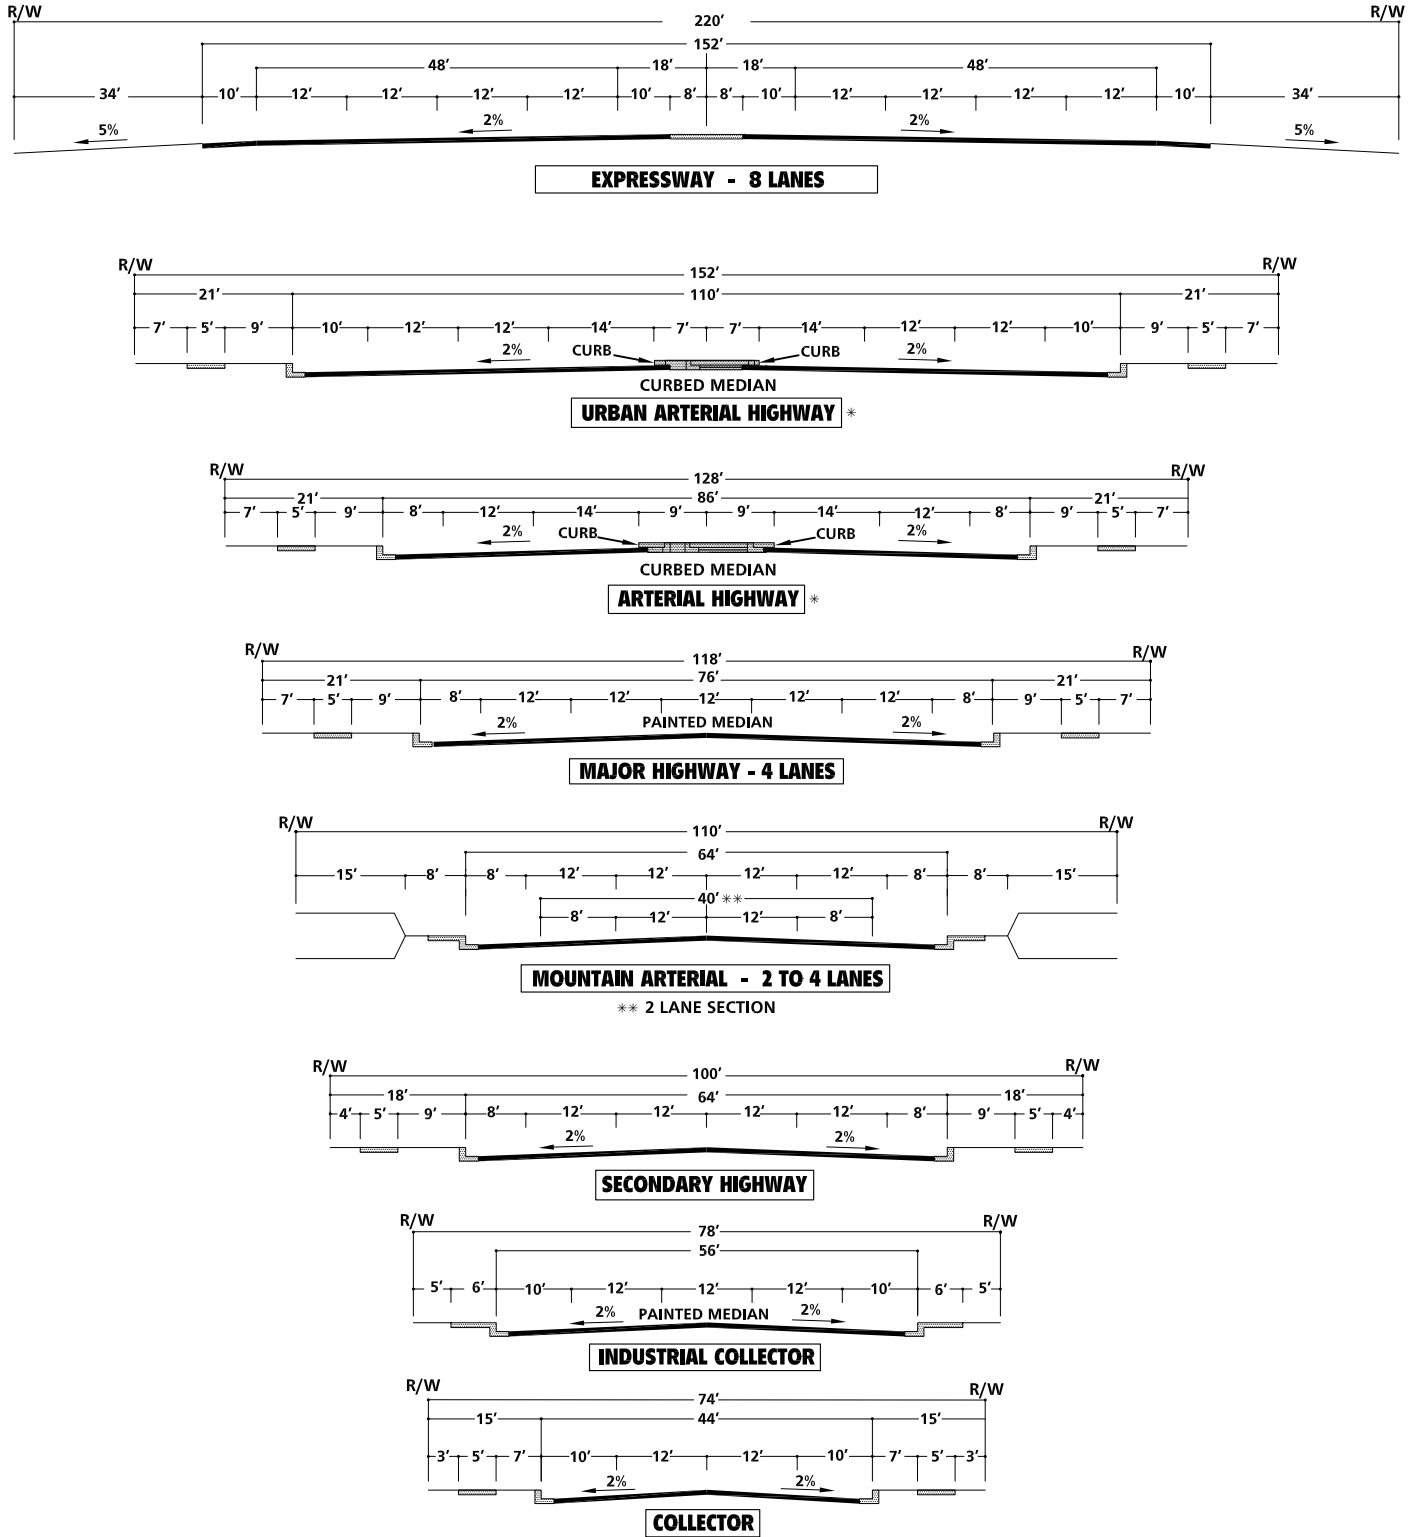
RIVERSIDE COUNTY GENERAL PLAN ROADWAY CROSS-SECTIONS
